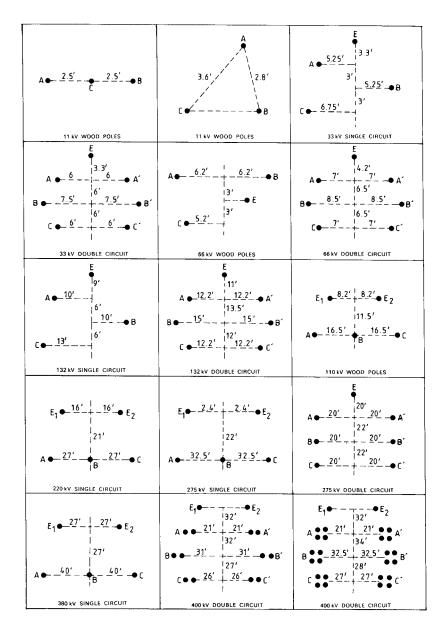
Typical wood pole and steel lattice tower conductor arrangements and spacings
